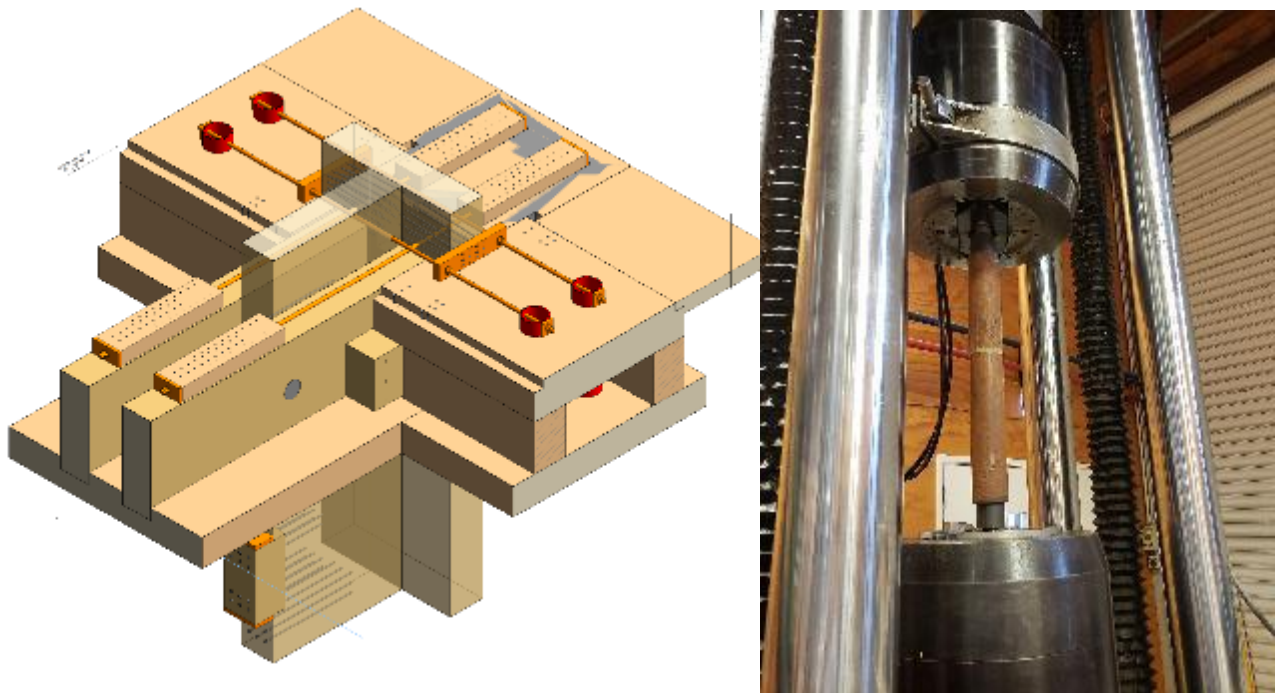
Left: The typical 2-way beam column joint; Right: Testing of the steel dampers
